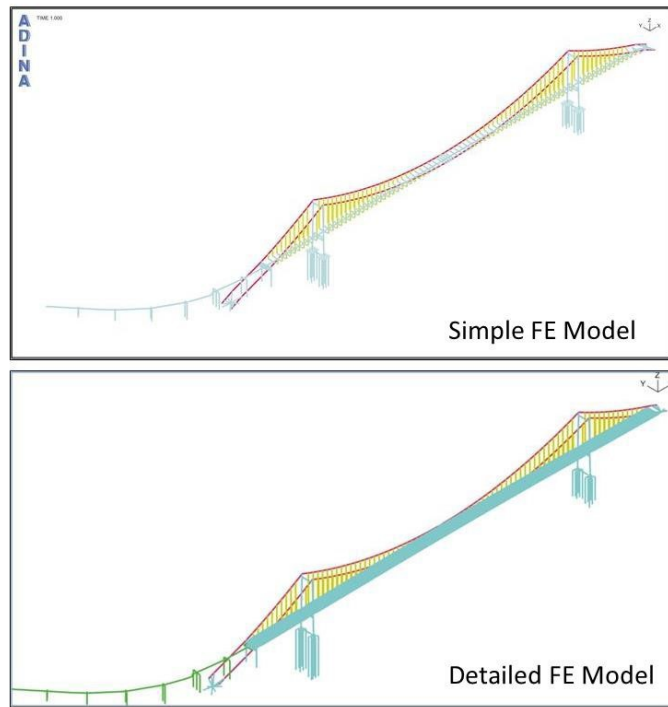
SC Solutions' Finite Element Models for the New Carquinez Bridge.
